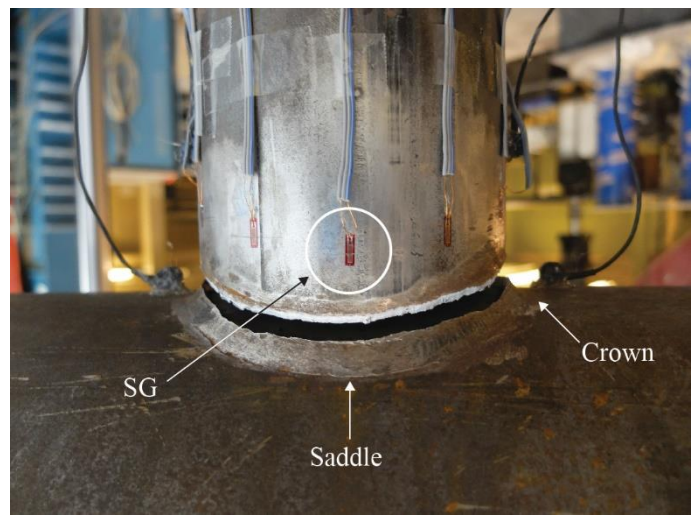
Strain gauges near weld toe and weld fracture in test 127-273-90a.
